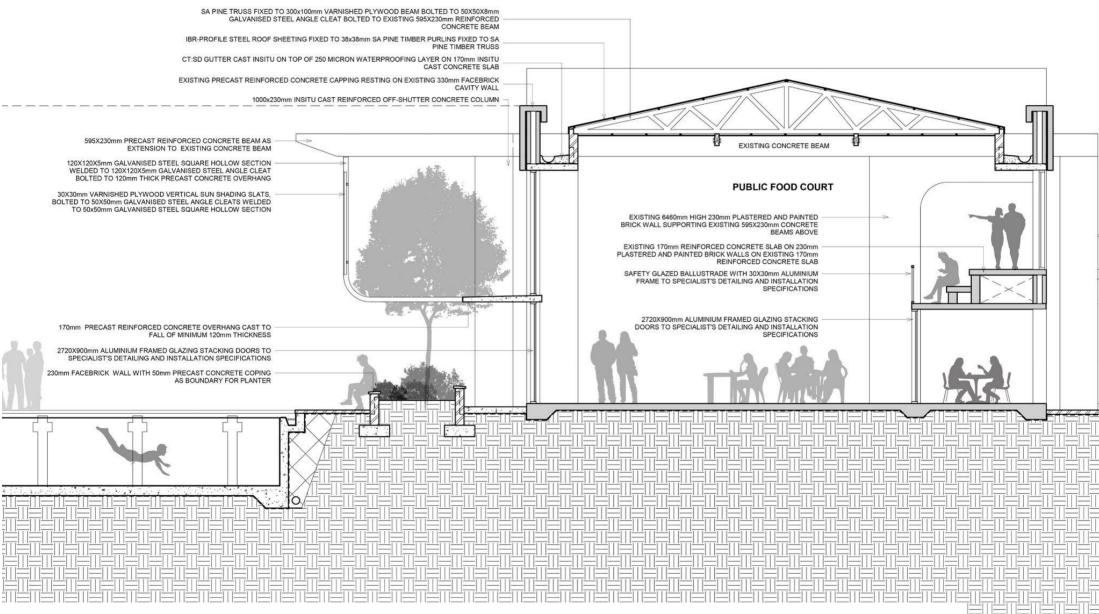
Callout of area on section where language 3 was expressed: Section through the food hall showing the stepped facade and shading (Author, 2021) © University of Pretoria
